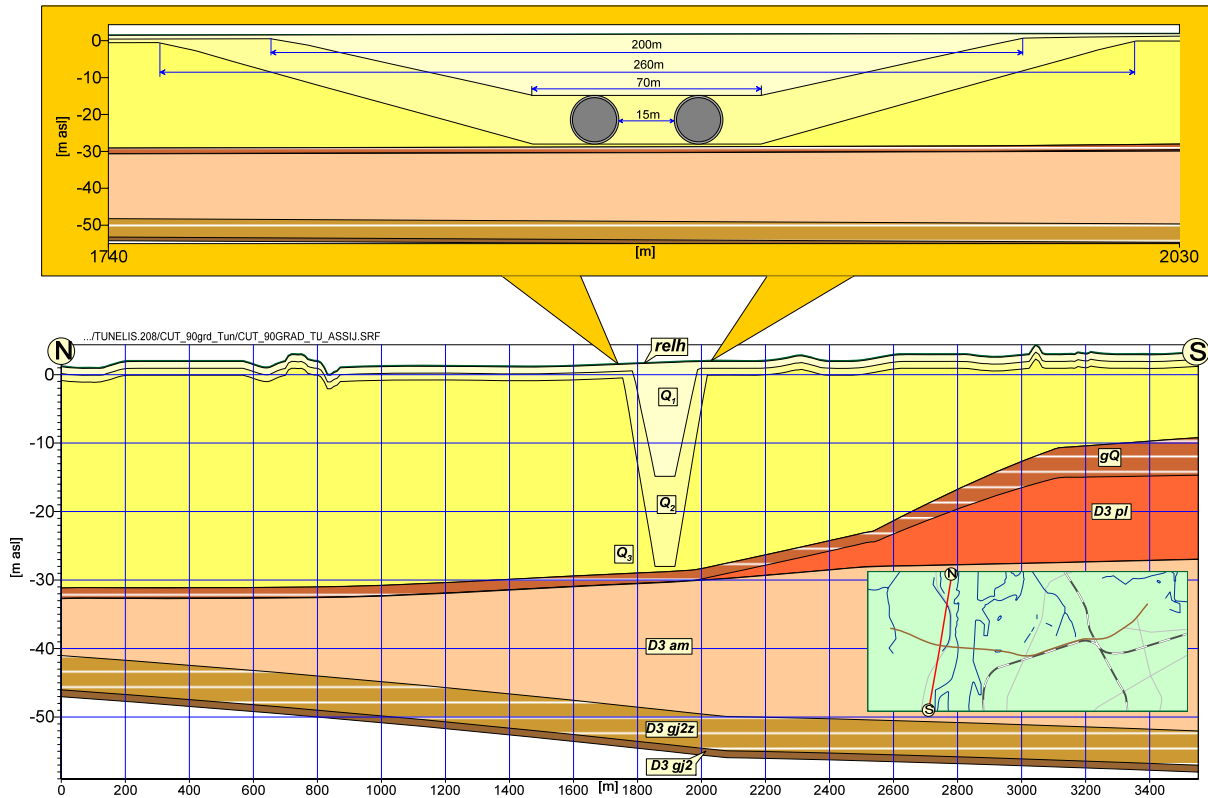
Cross section NS; approximation of tunnel system and its surroundings.
